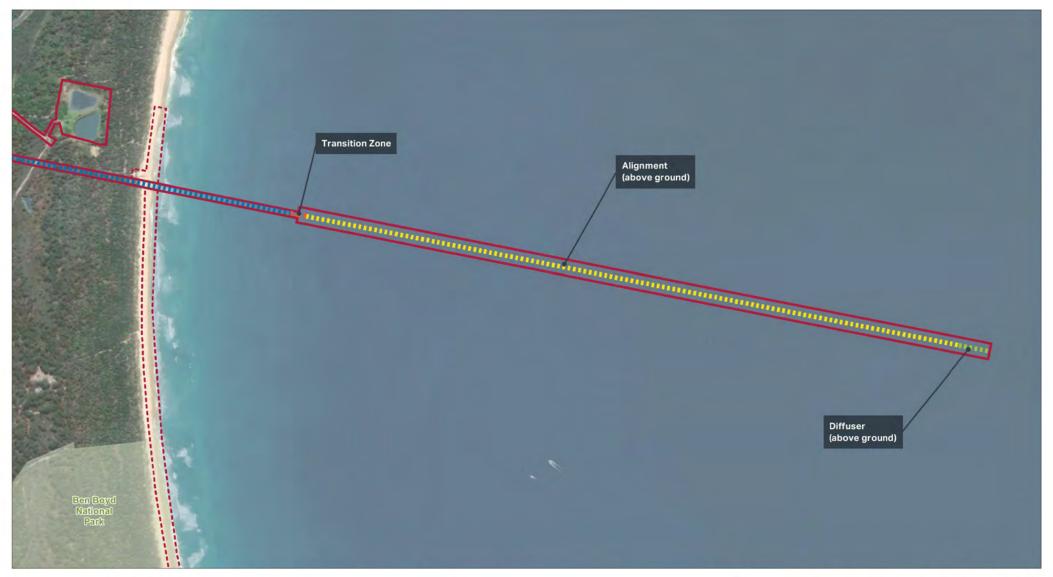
OCEAN OUTFALL PIPELINE - SECTION 2 (ABOVE SEAFLOOR)
